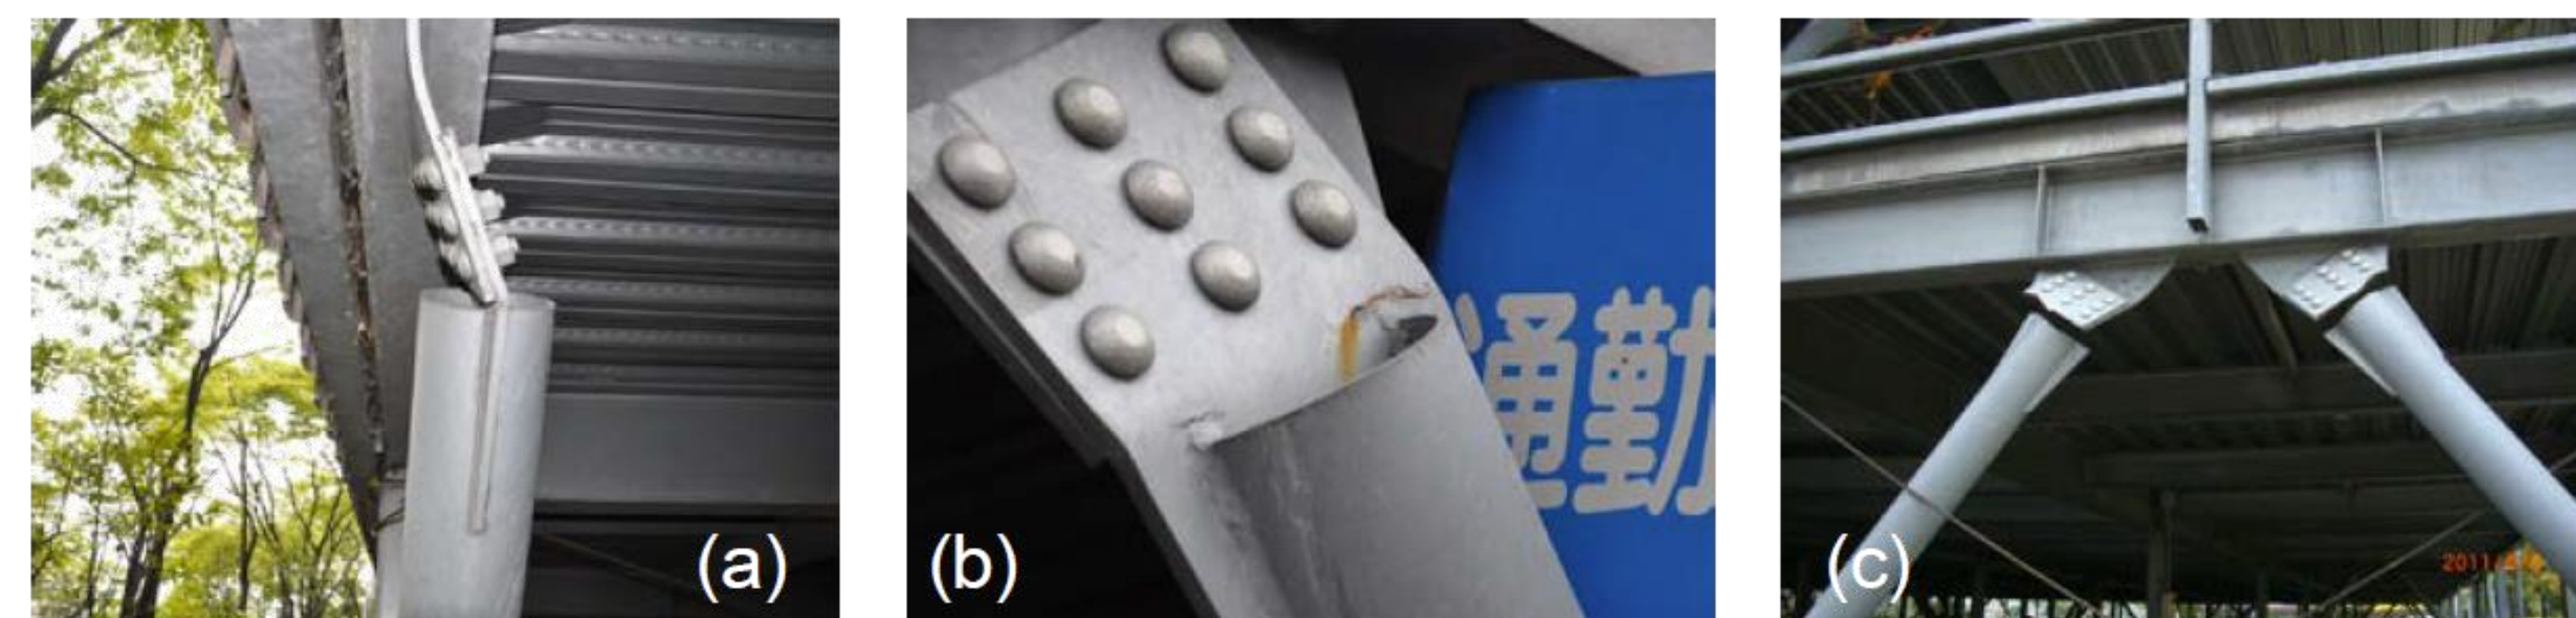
Connection damage: a) bent out of plane; b) fracture initiation; c) complete fracture
